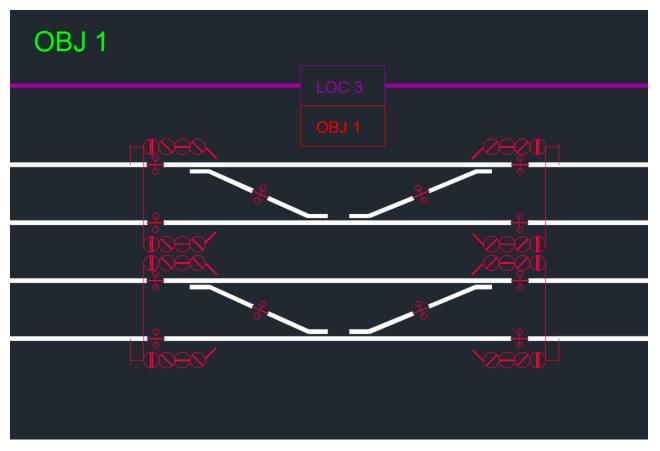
Signalling Scheme Plan (Memorial Road – South Circular Road Junction)
